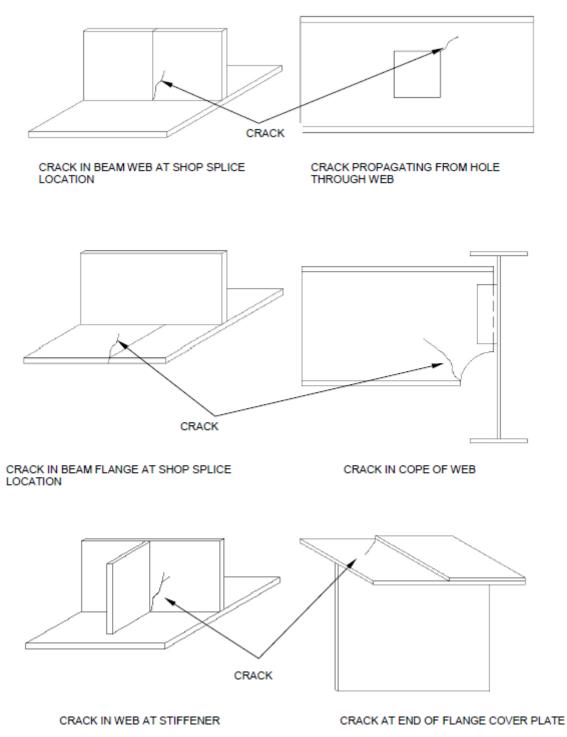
Common crack locations in steel structures (Sheet 2)
